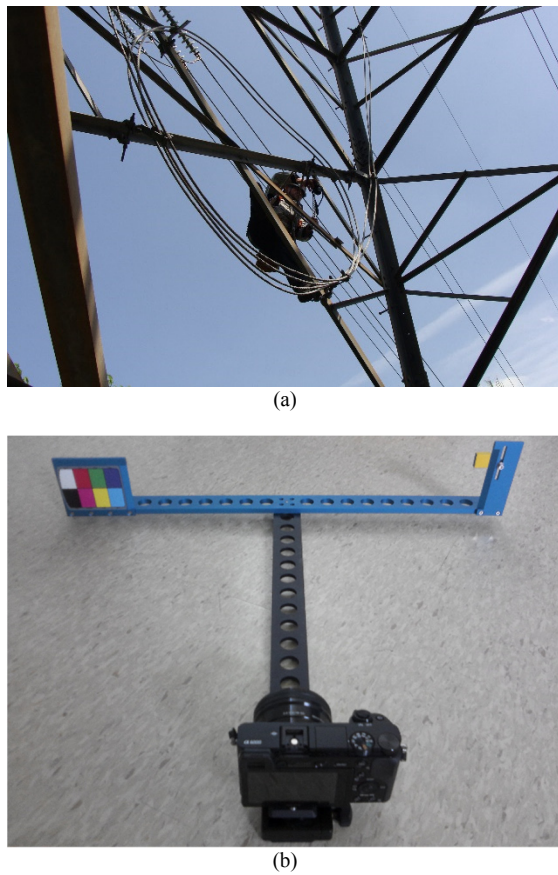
Camera equipment for corrosion deterioration inspection tool. (a) safety inspection scene, (b) camera equipment.
